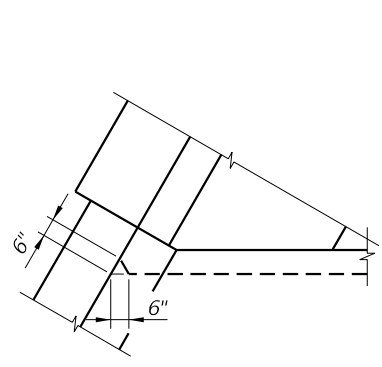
DETAIL "C" - PLAN VIEW WINGWALL TO BOX CONNECTION (Left Begin Corner Shown, Other Corners Similar)
